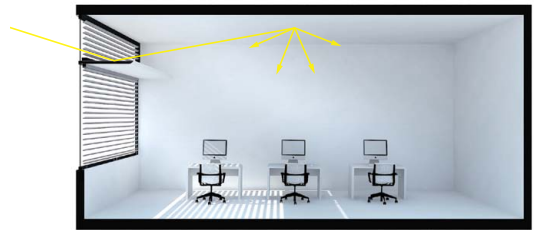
| TYPICAL DIAGRAM OF EXTERNAL LIGHT SHELVES
